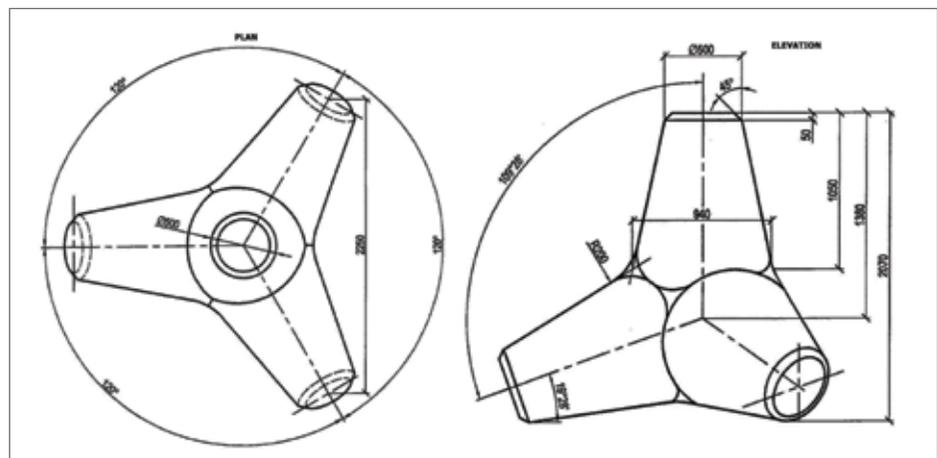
Tetrapod – 5 T (Plan & Elevation)
